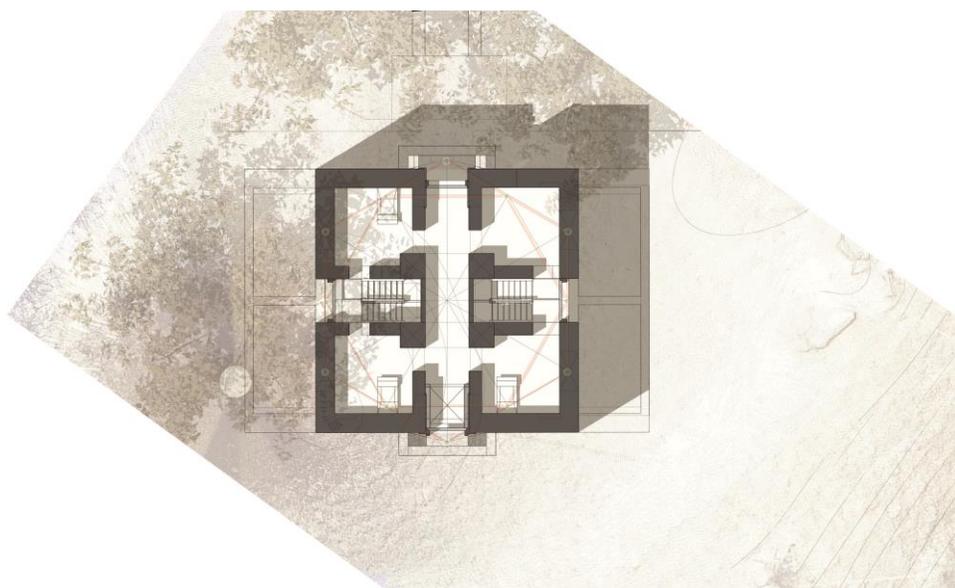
Blackwell Tower: Fifth Floor Plan Diagram
